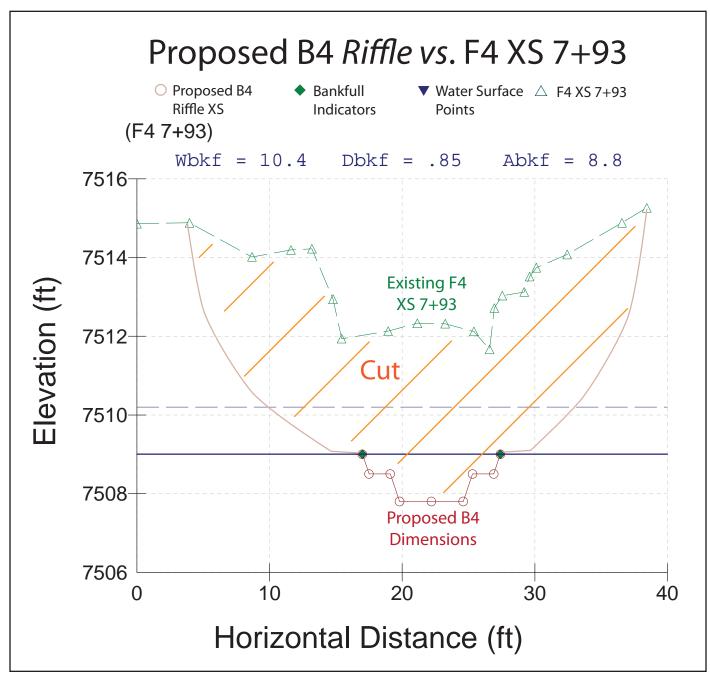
The proposed B4 *riffle* cross-section compared to the existing F4 cross-section 7+93, indicating the substantial excavation required.
